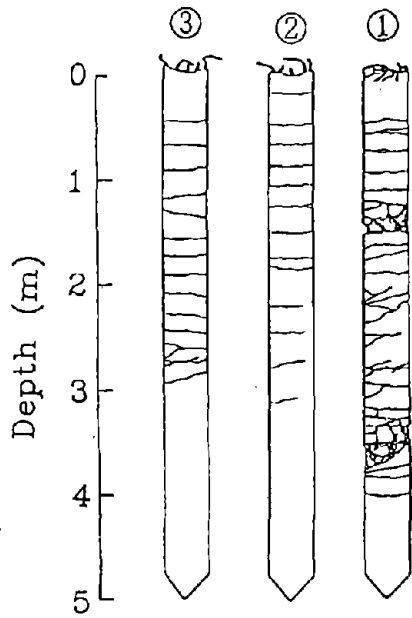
Damage to the Foundation Piles of S-Building¹¹⁾
